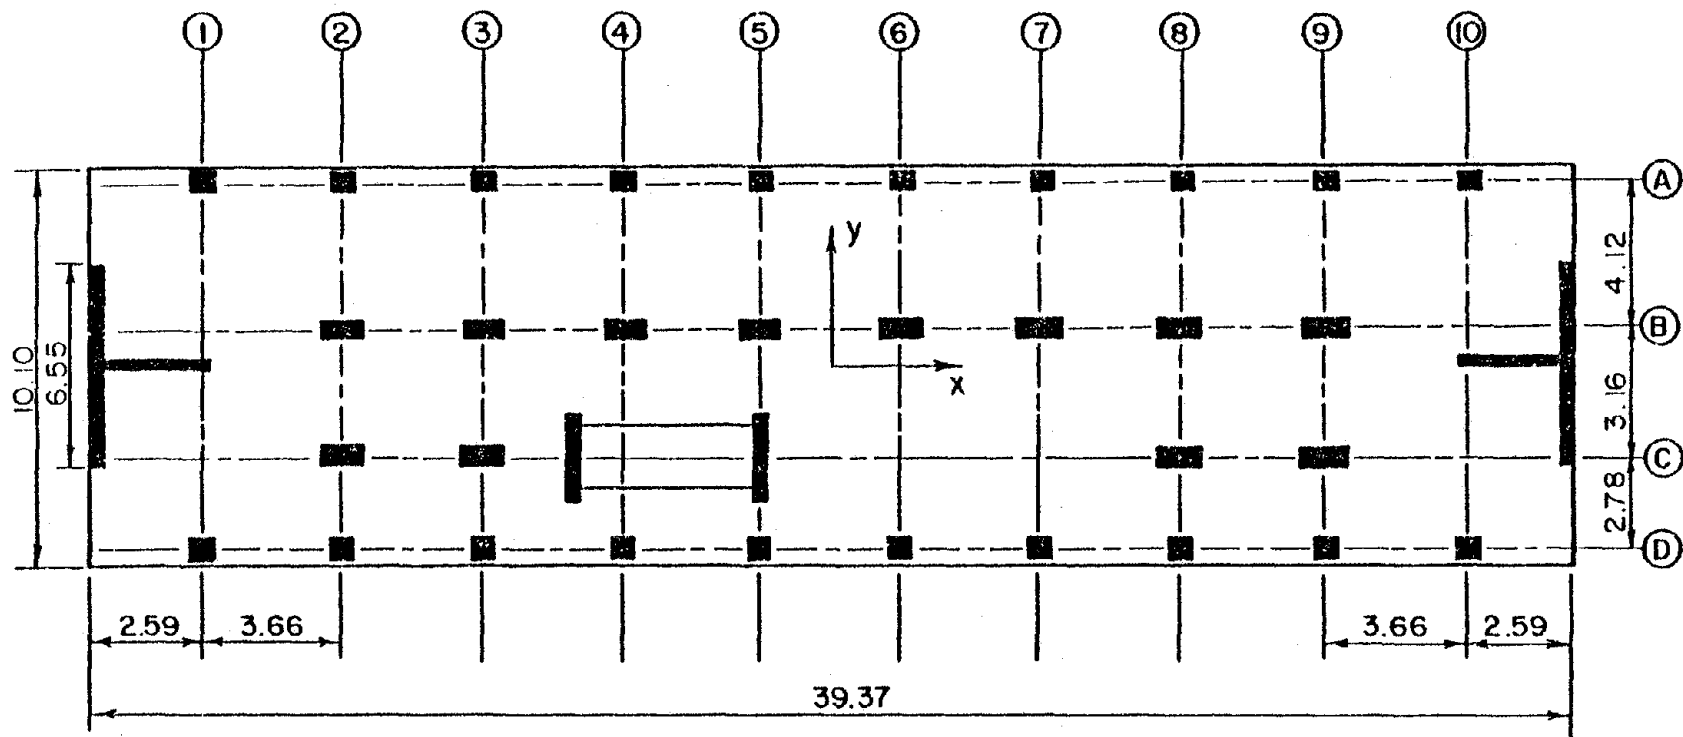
Typical Plan View of the Residential Nautical College (All Dimensions in Meters).
